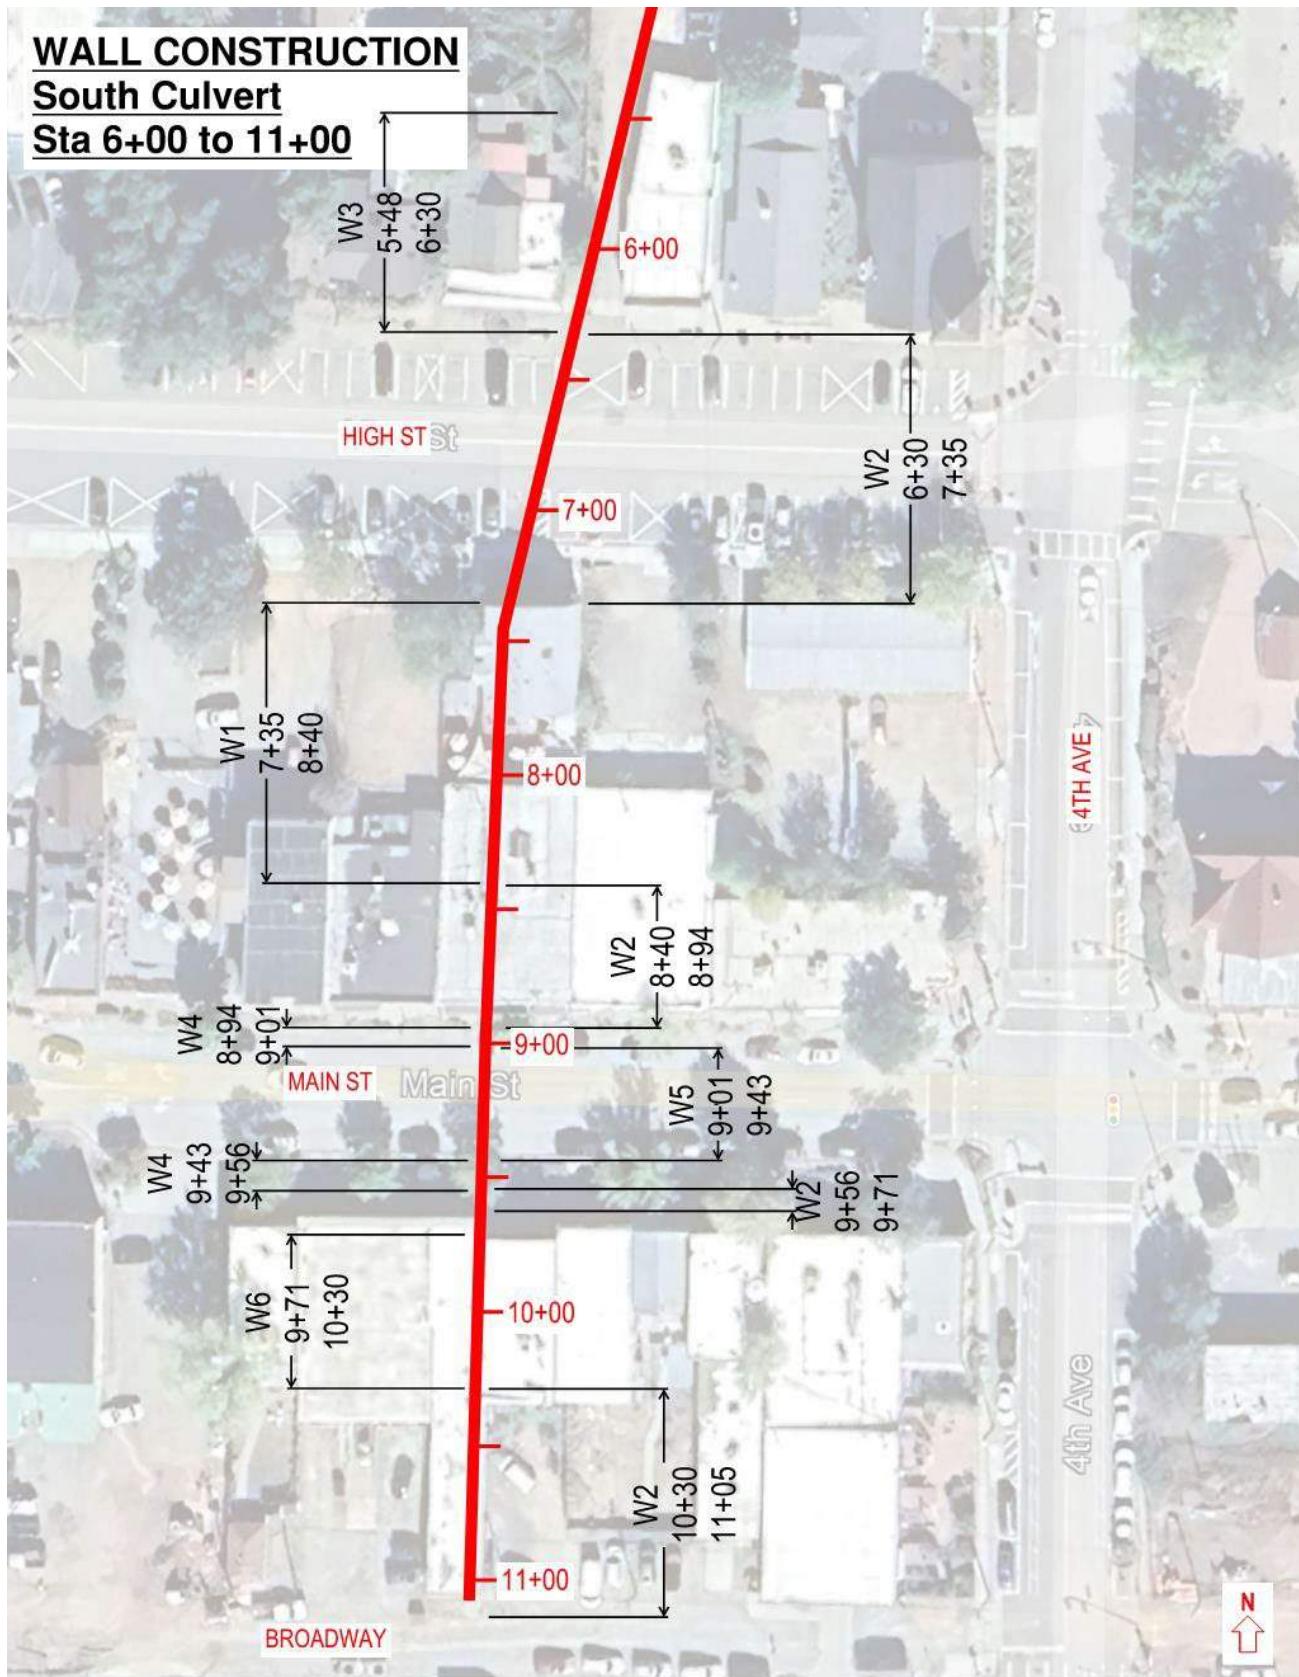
South Culvert Wall Construction Stations (S)6+00 to (S)11+00
